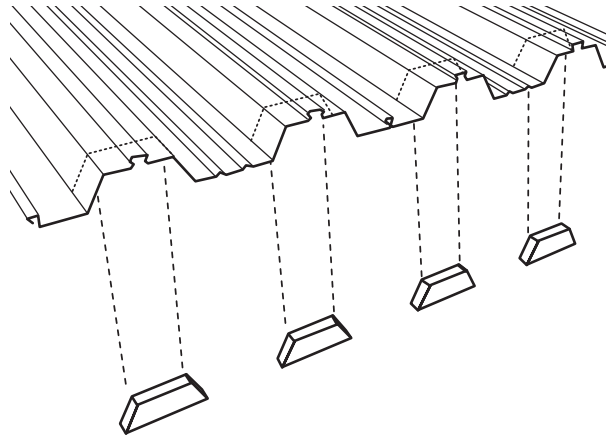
J RF55® Wedge Nut Threaded Service Hanger
